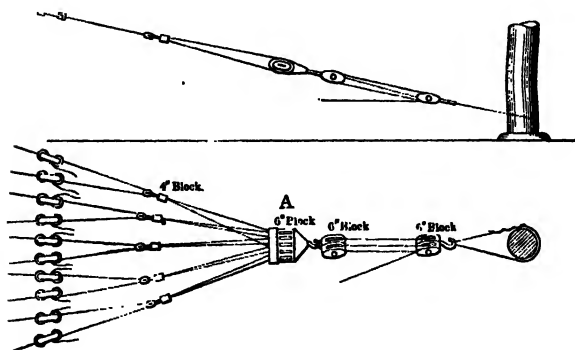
Elevation and Plan of Clamps and Tackle Used in Pulling the Line Wires
